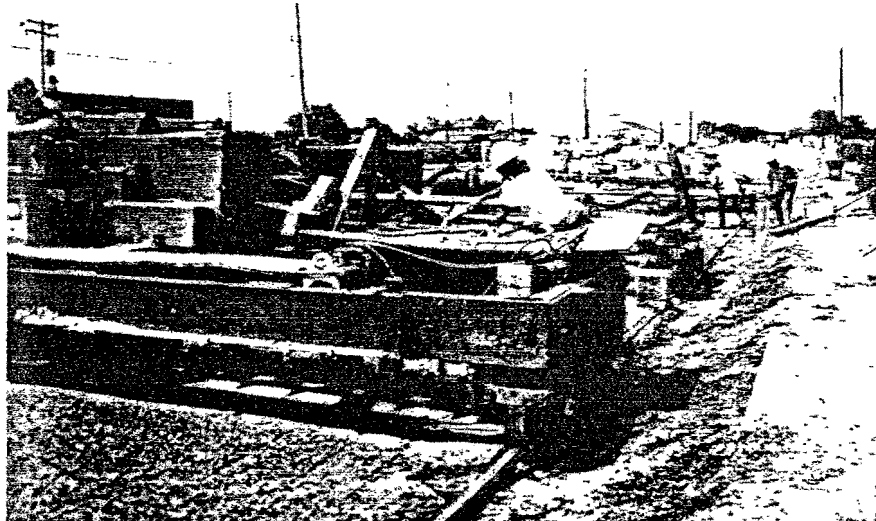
"Equipment Spread" used in Construction of Scott Street in Houston, Texas (Test site No. 10)
